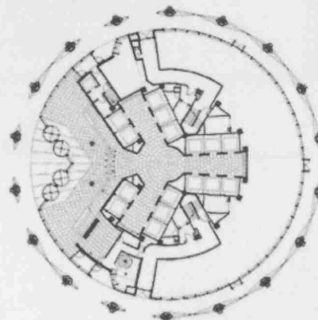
Floor plans in different levels of Swiss Re Tower. (Source: Powell 2006 pp. 75)
